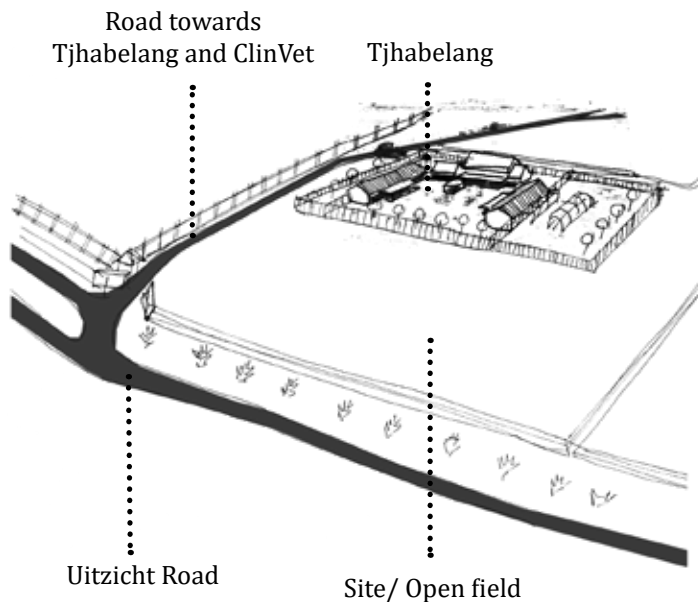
Drawing illustrating dirt roads to site (Caldeira, 2019: own drawing).
